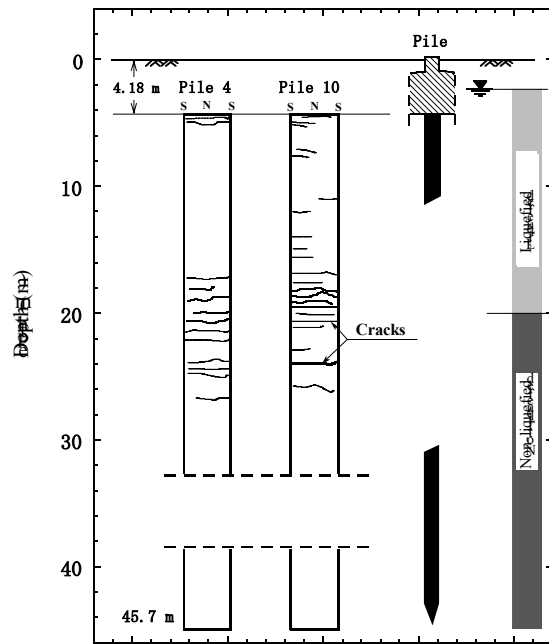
Observed damage to piles of Pier 211 (Hanshin Highway Authority, 1996)
